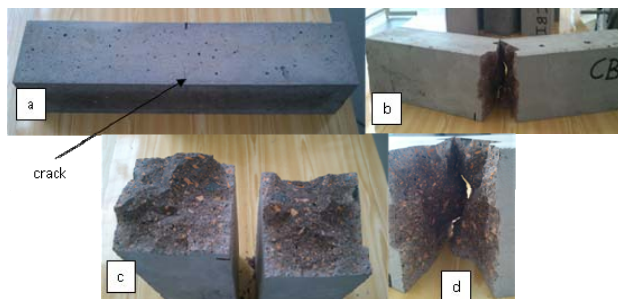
Damage beam CB II; a- beam after damage, b- beam after crack, c, d- surface crack
